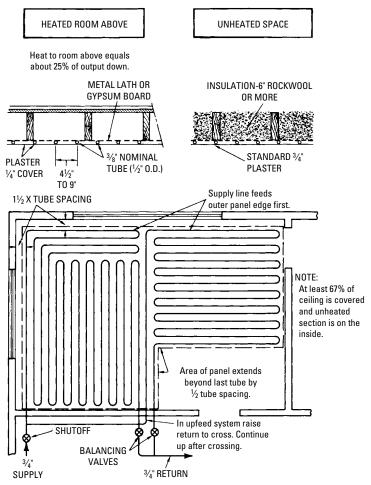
Diagram of a typical radiant ceiling heating panel.
